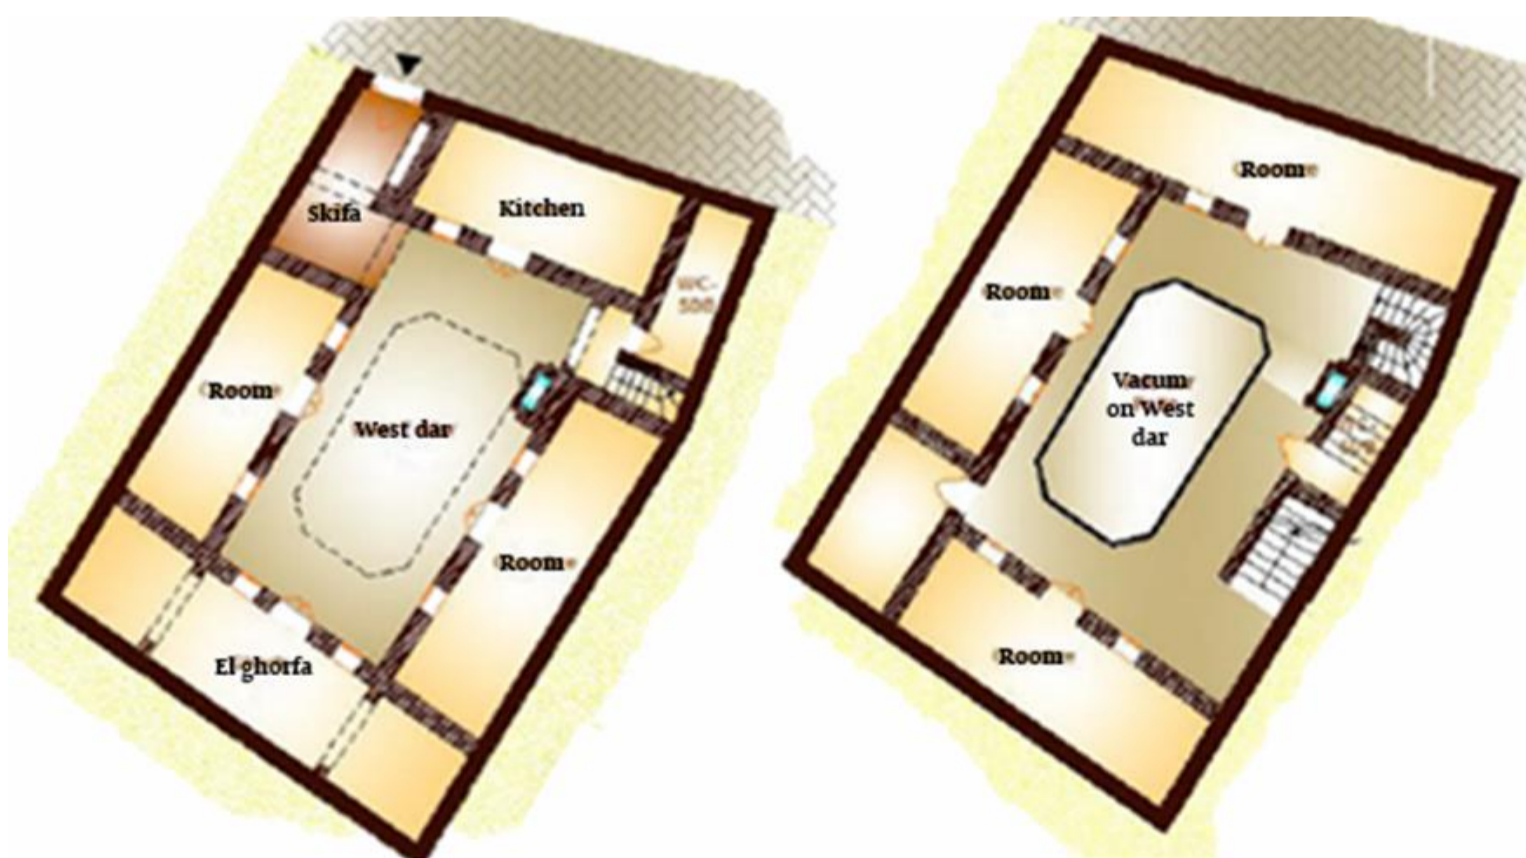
Plan of the DRC and 1st floor of Dar Hssayen of the medina of Tlemcen.
